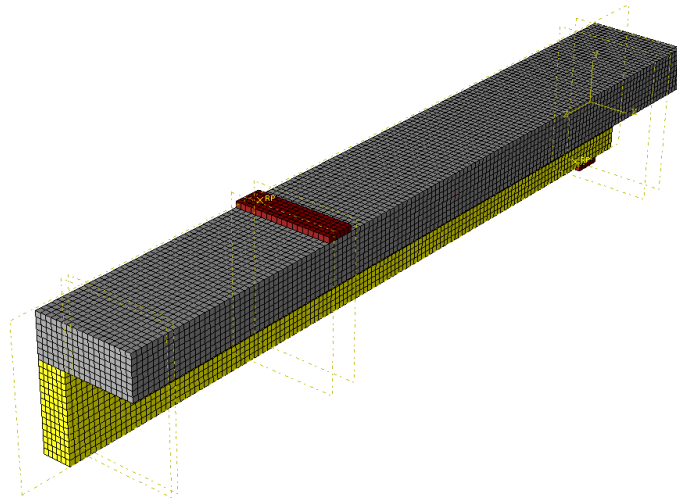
Timber-concrete composite beam with monolithic concrete slab
